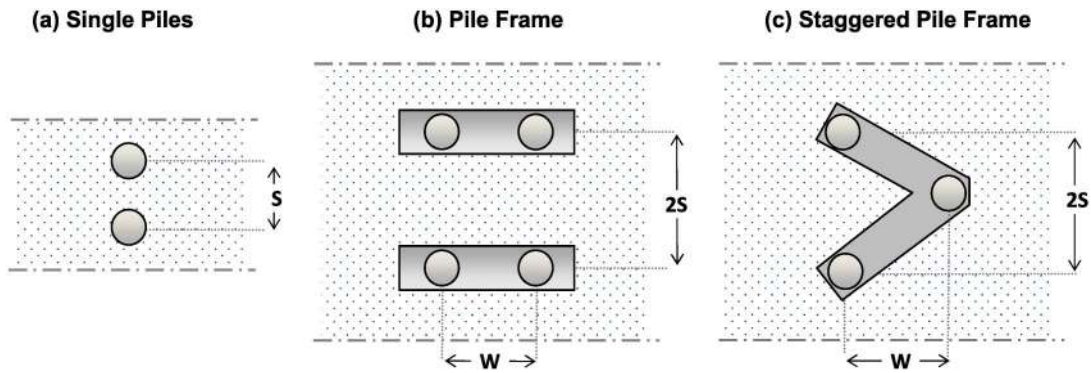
Definition of the equivalent pile-frame configuration: (a) single piles; (b) two-pile frame; (c) staggered pile frame
